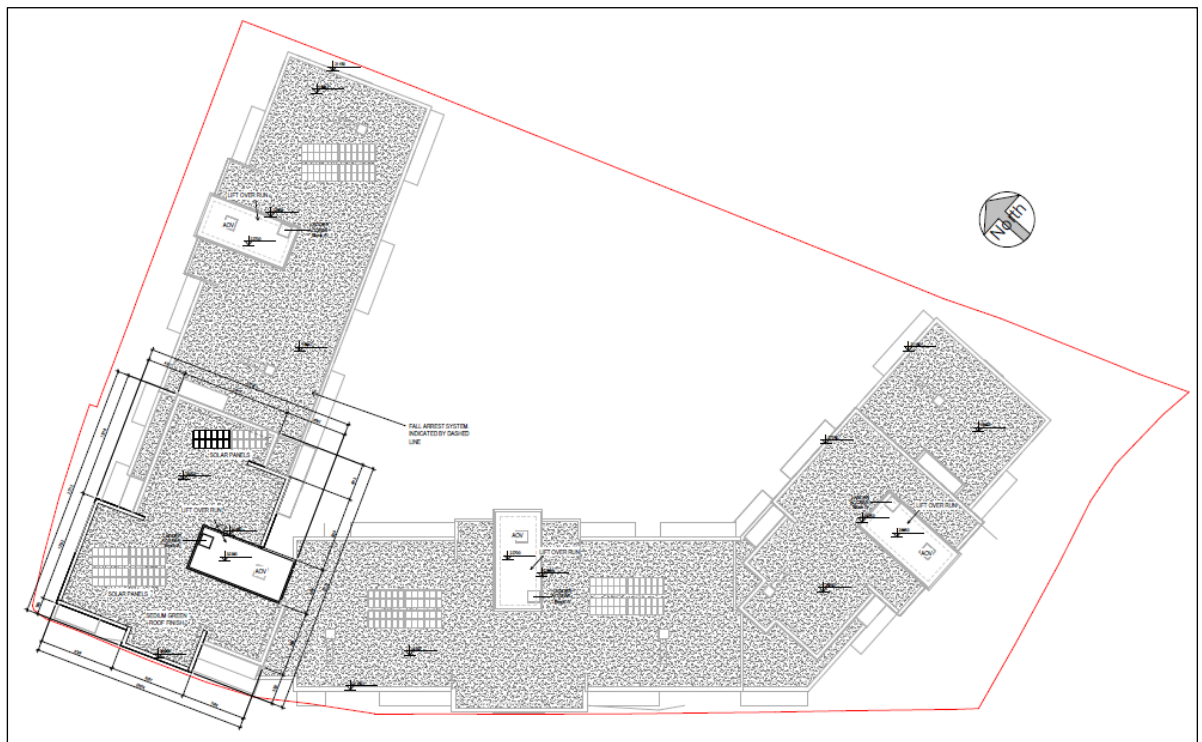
Roof plan of proposed amended development under ABP Ref. ABP-307177-20
